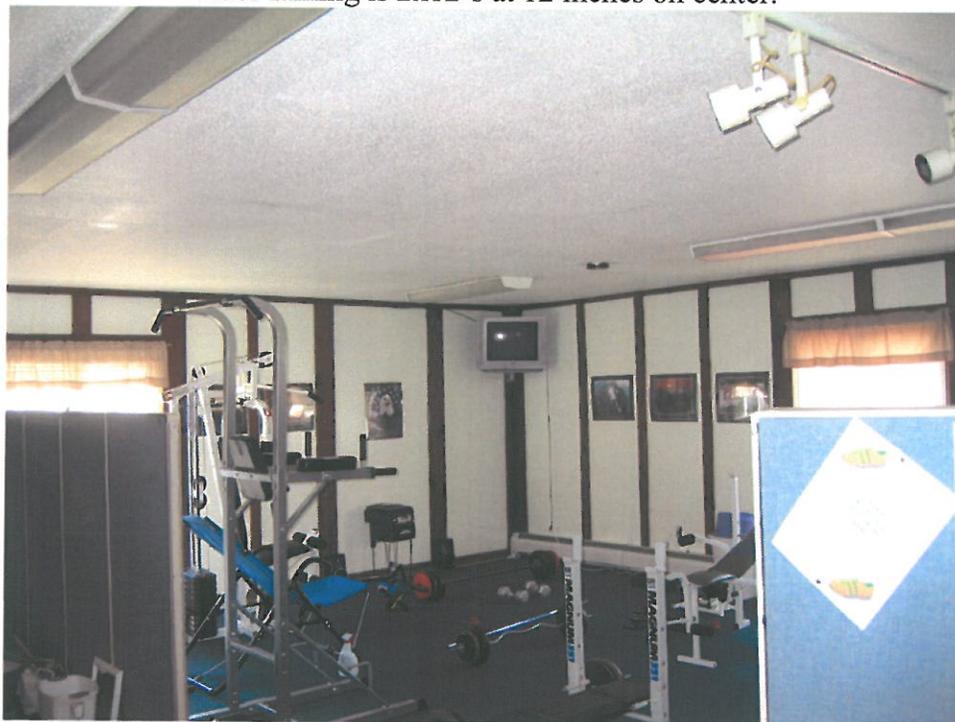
Second floor south corner. Note there are no visible cracks in the ceiling or walls in the area above the crack at the first floor.
